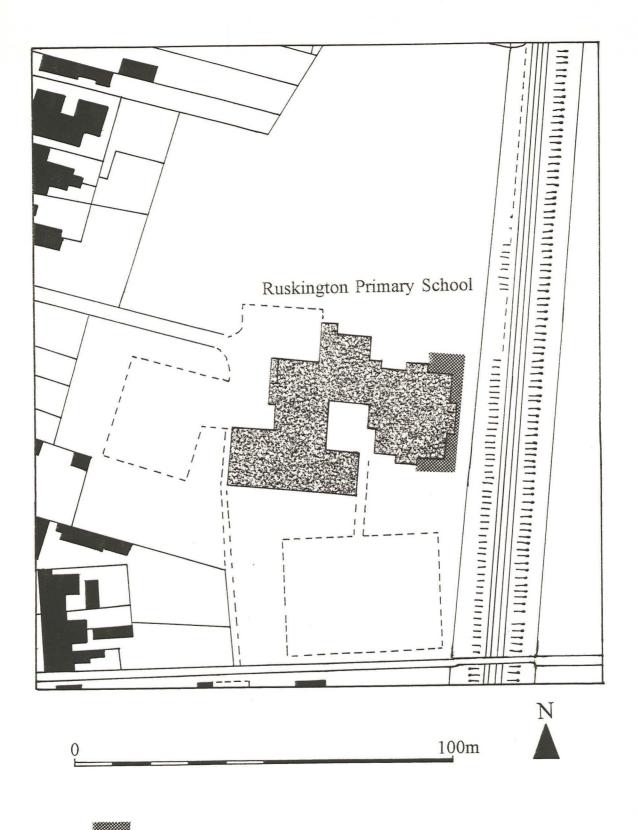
DEVELOPMENT AREA LOCATION PLAN
